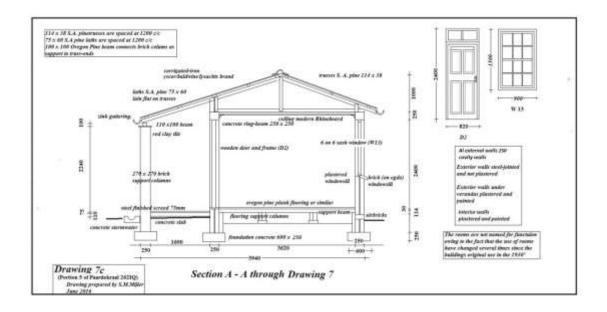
Above. Section A –A through unit in Drawing 7. (Drawing S.M. Miller 2016.)
